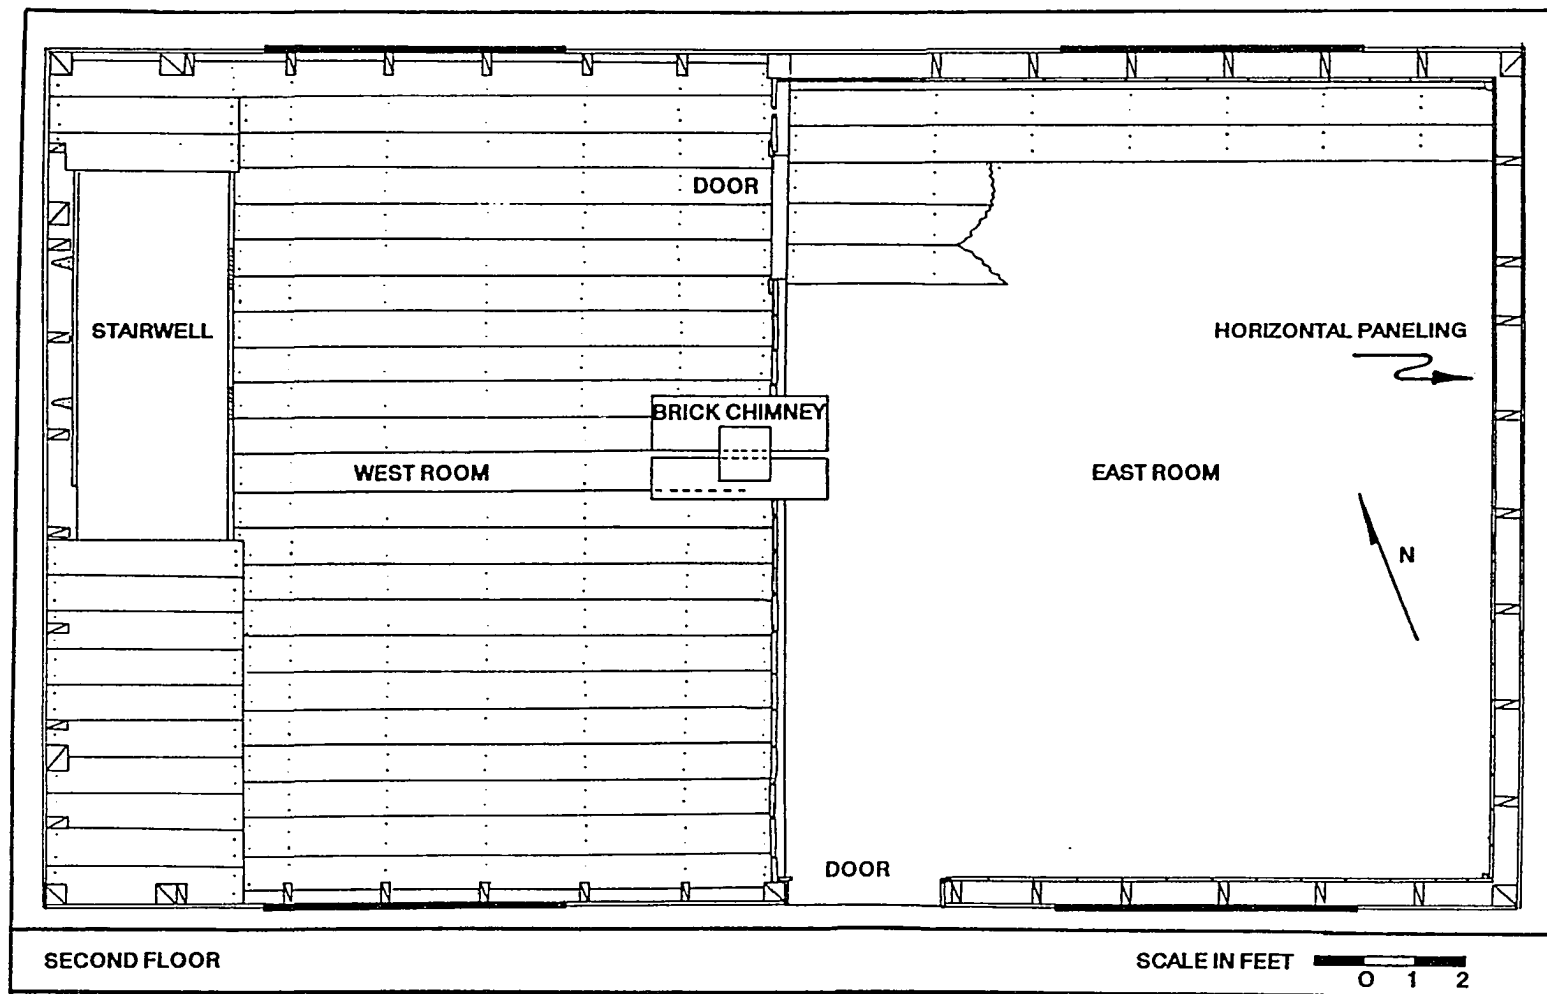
Plan of Kersh shop second floor. Drawing, JMUARC. Kersh collection, MAFC.
